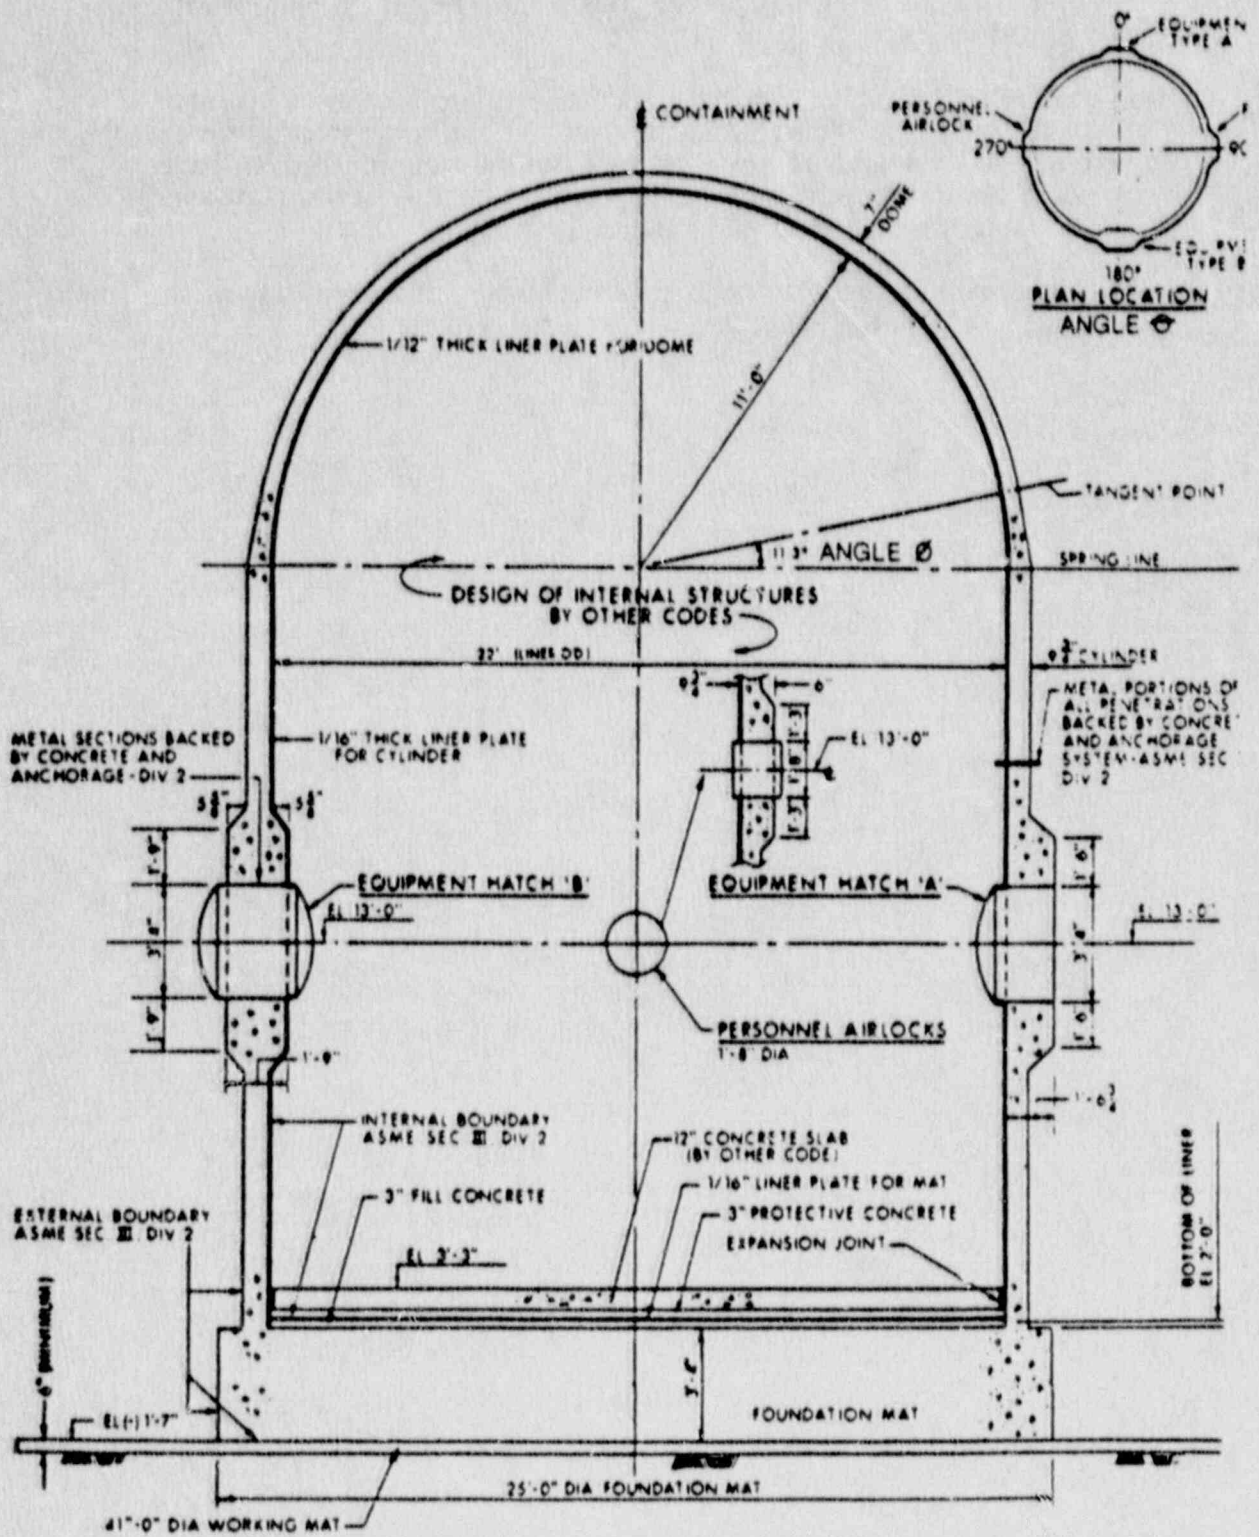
Typical Section Through 1/6-Scale LWR Reinforced Concrete Model
